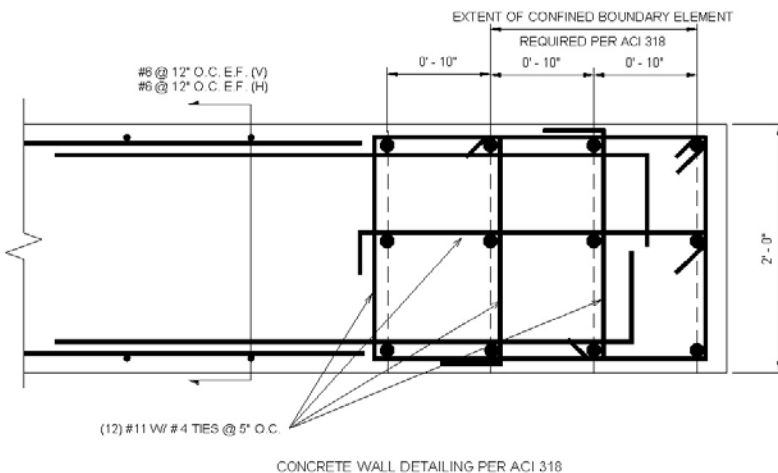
Shear wall boundary element detailing for the U.S. configuration.
